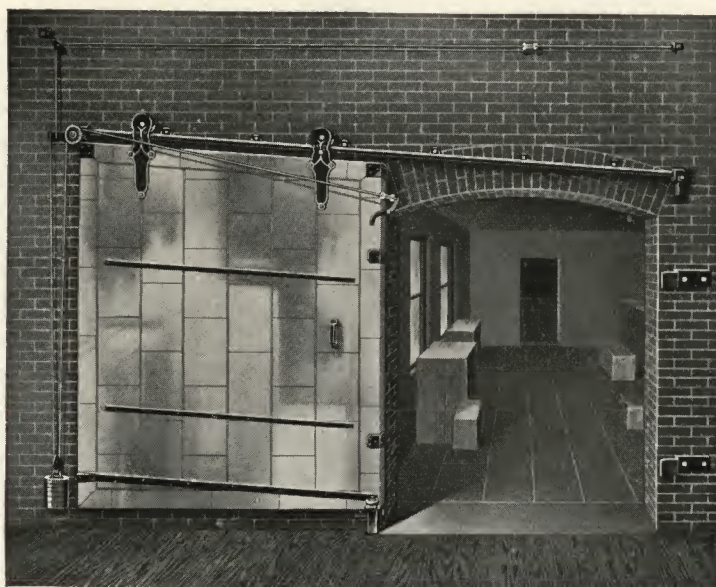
No. 645 Fire Door Fixtures Applied to Left Hand Tin Clad Fire Door.
